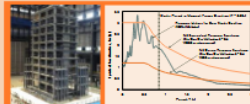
| 10-story RC moment frame building tested at the E-Defense shake table facility in Japan (Shimizu et al. 2017) and Department of Earthquake Engineering, NAGCE, Sendai, Japan.
